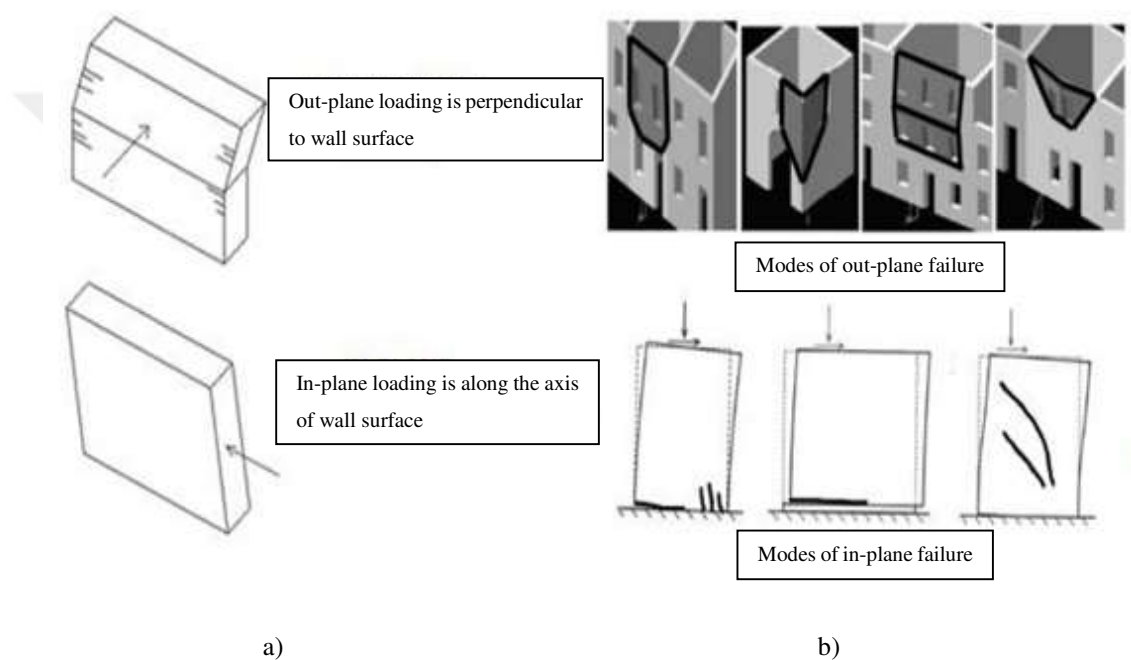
Types of masonry failure a) Out-of-plane and in-plane behaviour of a single wall and b) modes of mechanisms (Bucchi et al., 2013)
